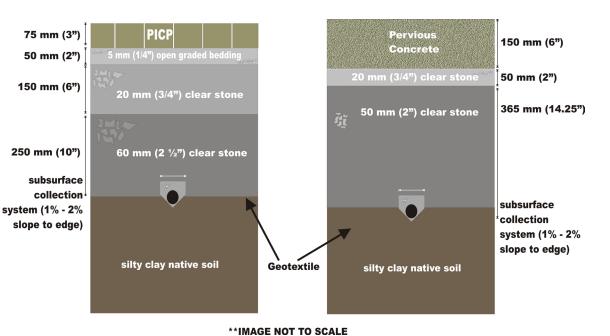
Cross section of the permeable interlocking concrete pavement and previous concrete.
